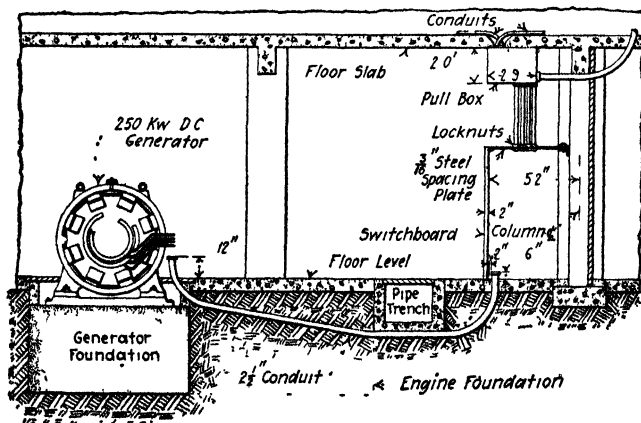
Conduit layout for generator and switchboard. Pull box and spacing plate are installed over switchboard. The spacing plate, in addition to supporting the conduit ends, grounds them to the switchboard steel frame which is itself grounded.
